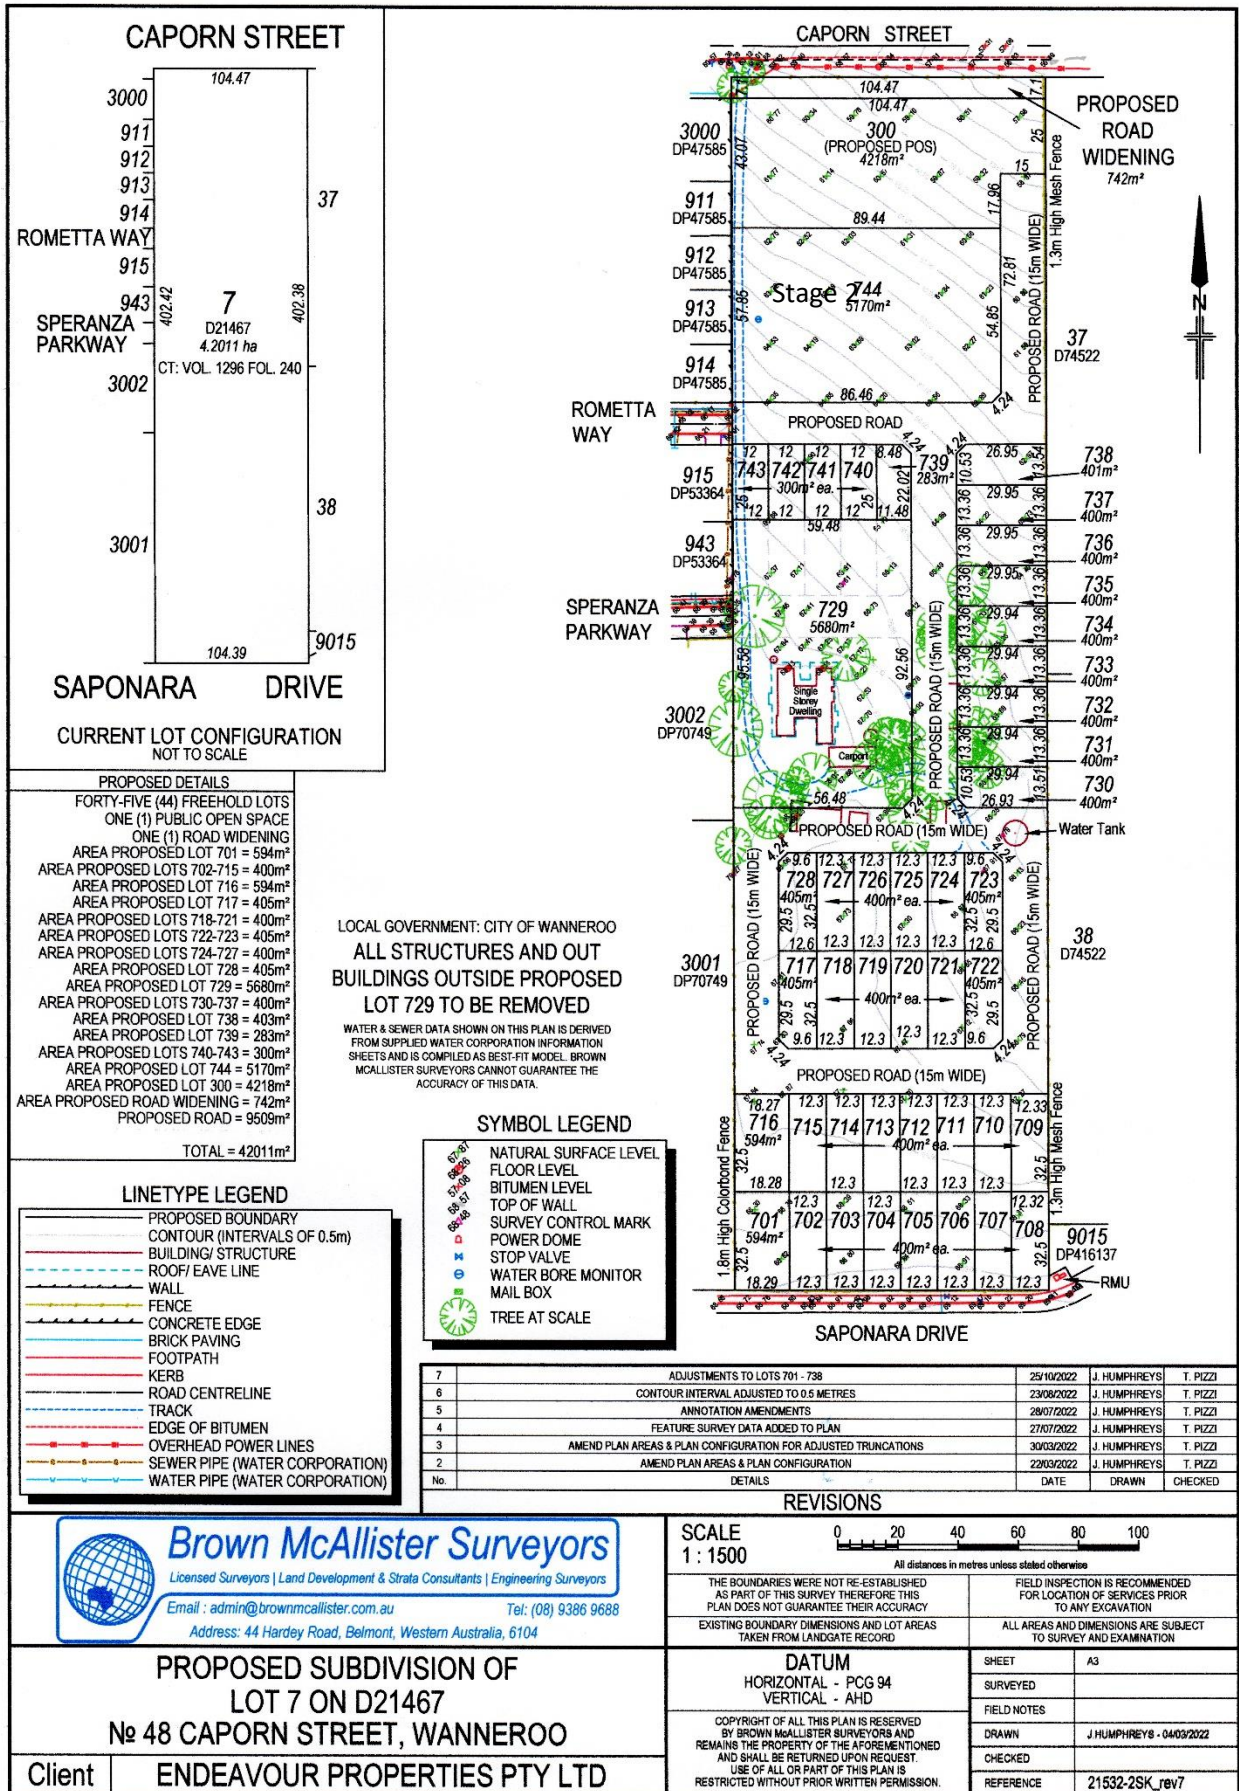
The copy of the site plan as provided with the structure plan/scheme amendment.
